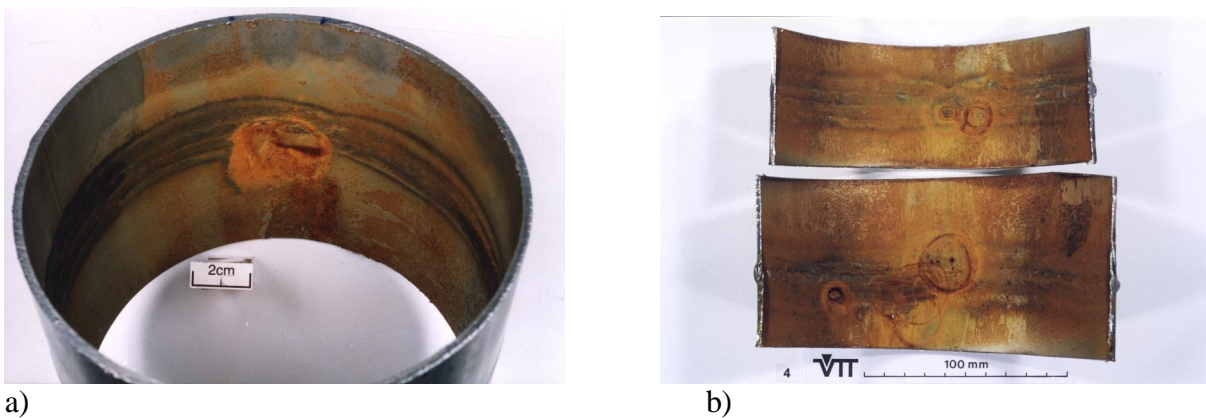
a) Reddish brown deposit seen on the inner surface of stainless steel type EN 1.4401 pipe section removed from the fire extinguishing system b) deposit rings surrounding pits on the welded areas of stainless steel type EN 1.4301 pipe samples removed later from the same fire extinguishing system.
